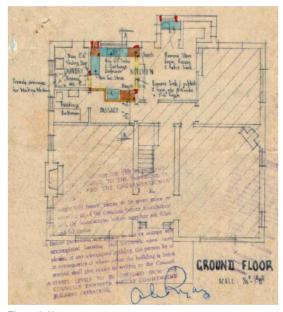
Proposed alterations to the building in 1958 designed by R. S. Hamilton. Source: Woollahra Council
